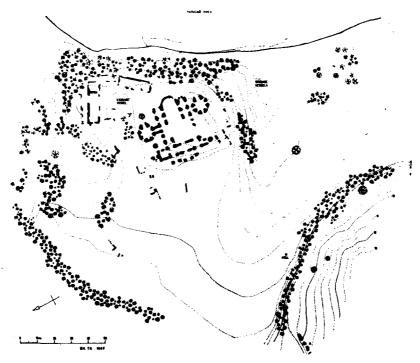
Fig. B. The Church at Dereağzī. Site Plan (Preliminary).
